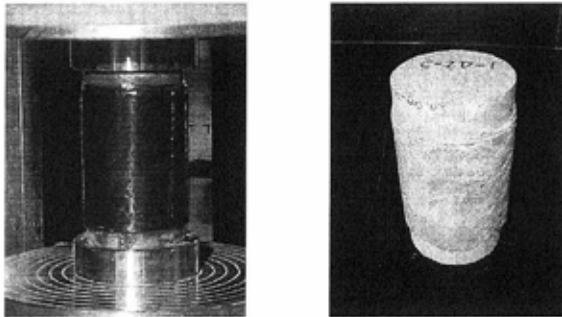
Confinement of concrete cylinders, to the left epoxy bonded CFRP and to the right CFRC wrapped specimen, courtesy of H.C. Wu.
